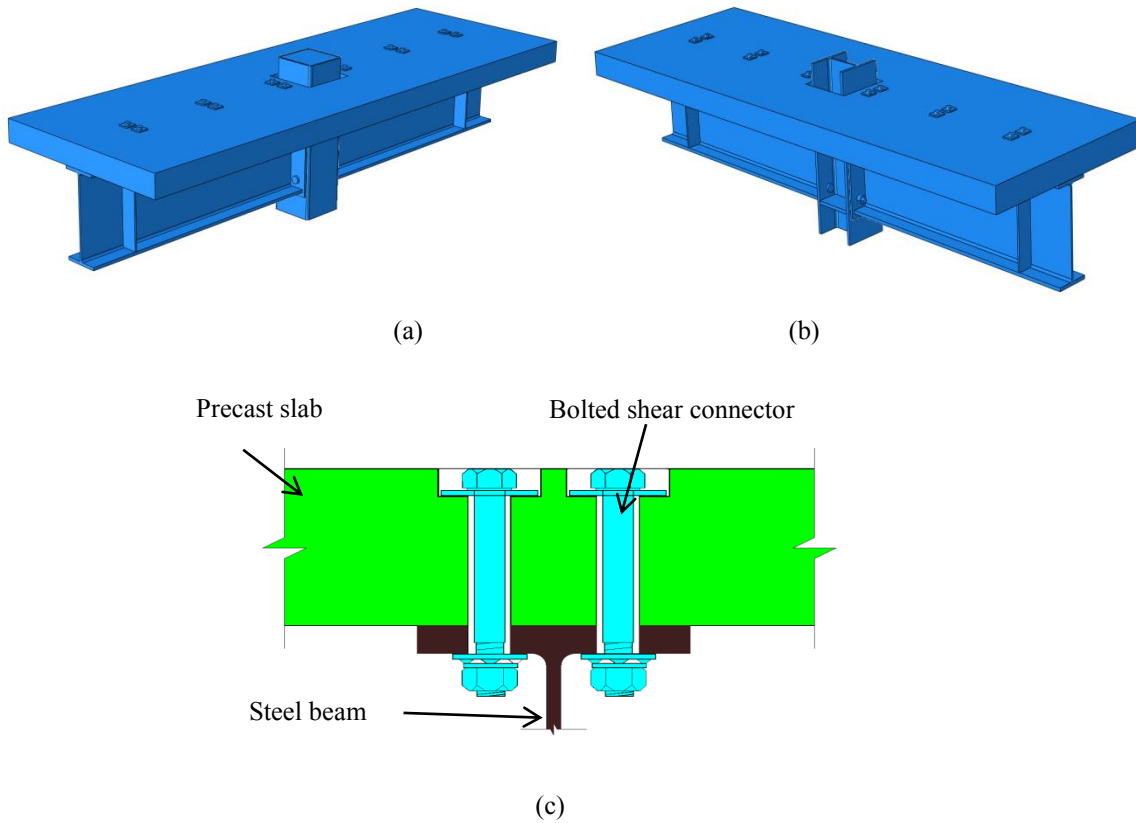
Schematic outline of deconstructable composite beam-to-column joint with flush end plate connection: (a) pictorial view of CJ1 and CJ2; (b) pictorial view of CJ3 and CJ4; (c) friction-grip bolted shear connection.
